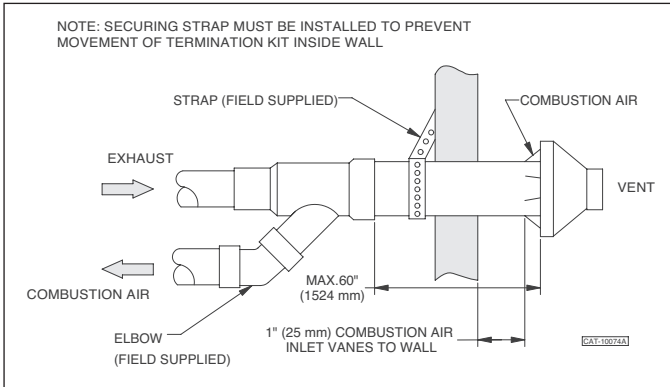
Horizontal Sidewall Concentric Venting, Single Termination
